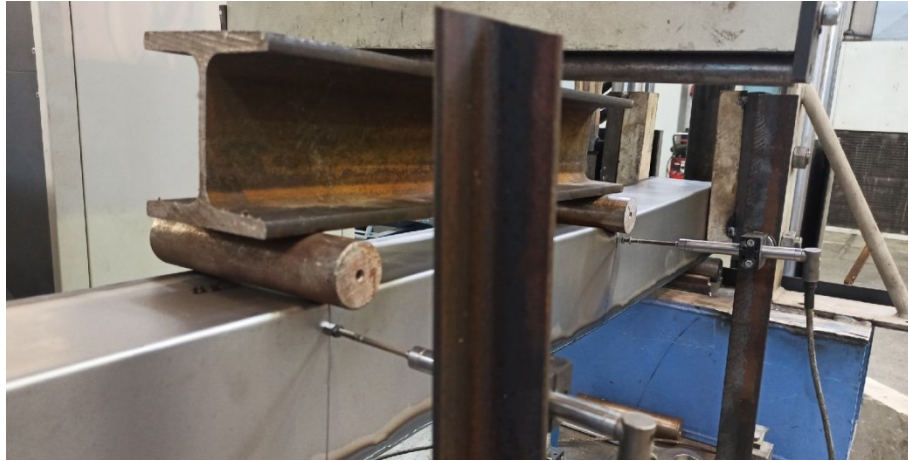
Beam 2 side view (flat 1.25 mm)
